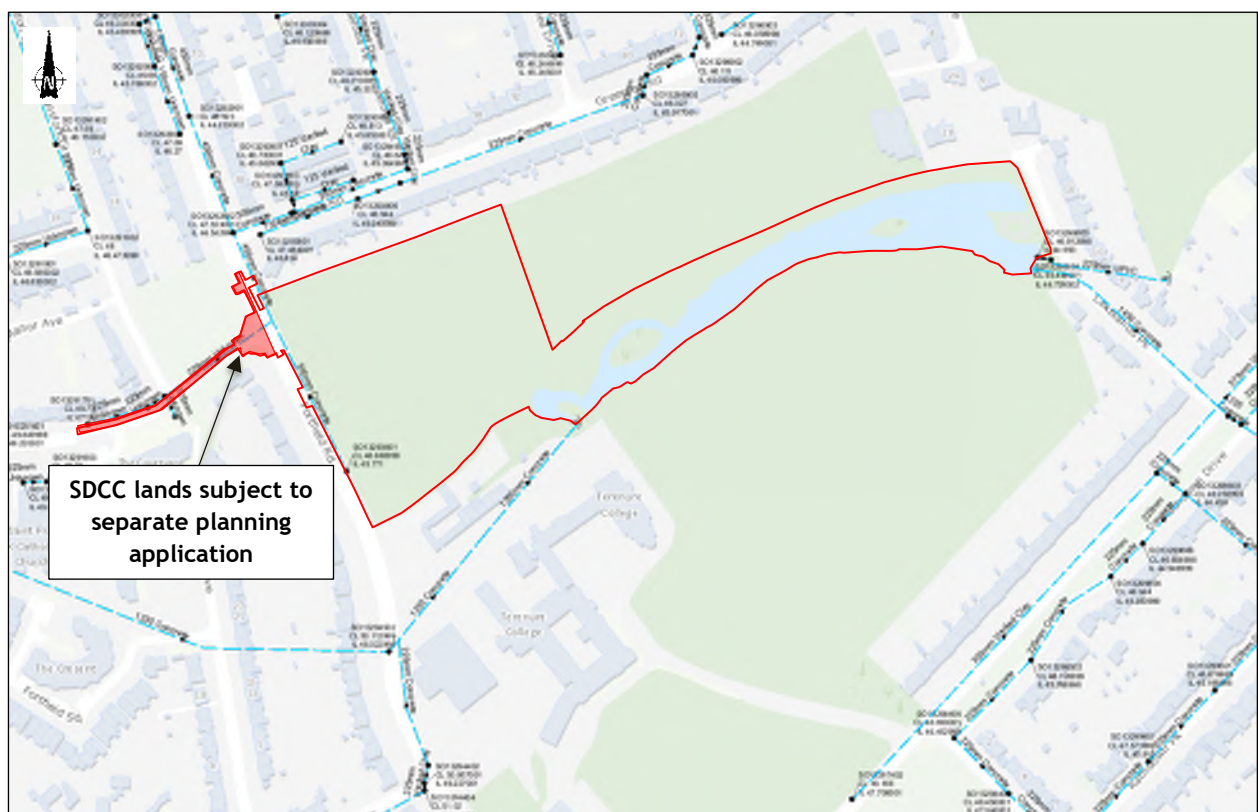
Existing stormwater drainage surrounding the development site shown in light blue (Extract from Dublin City Council records)
